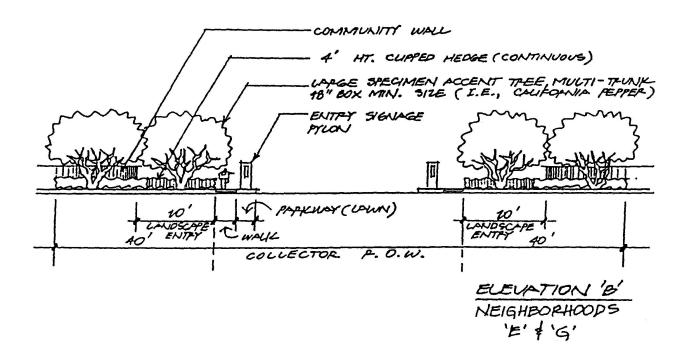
TYPICAL NEIGHBORHOOD ENTRY – ELEVATION
